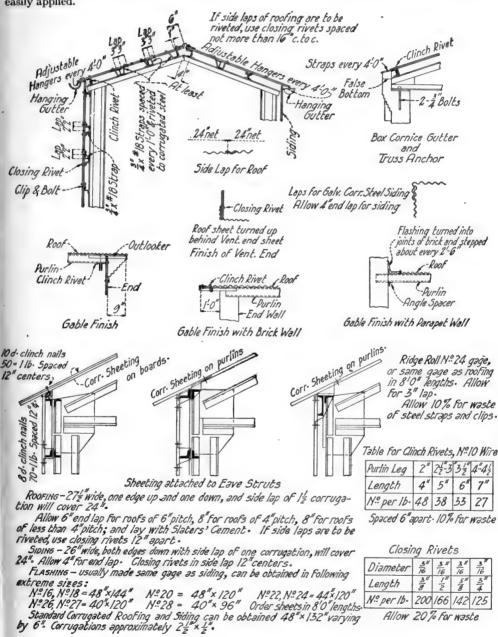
STANDARD DETAILS FOR CORRUGATED STEEL.
